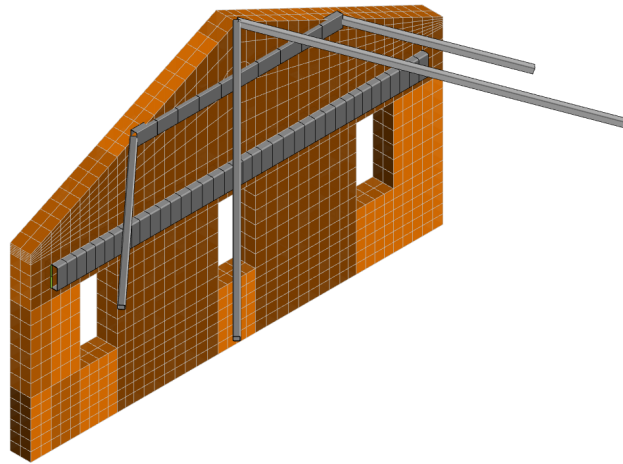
Isometric View of Fog Room Gabled Wall, DB+HSB Scheme
